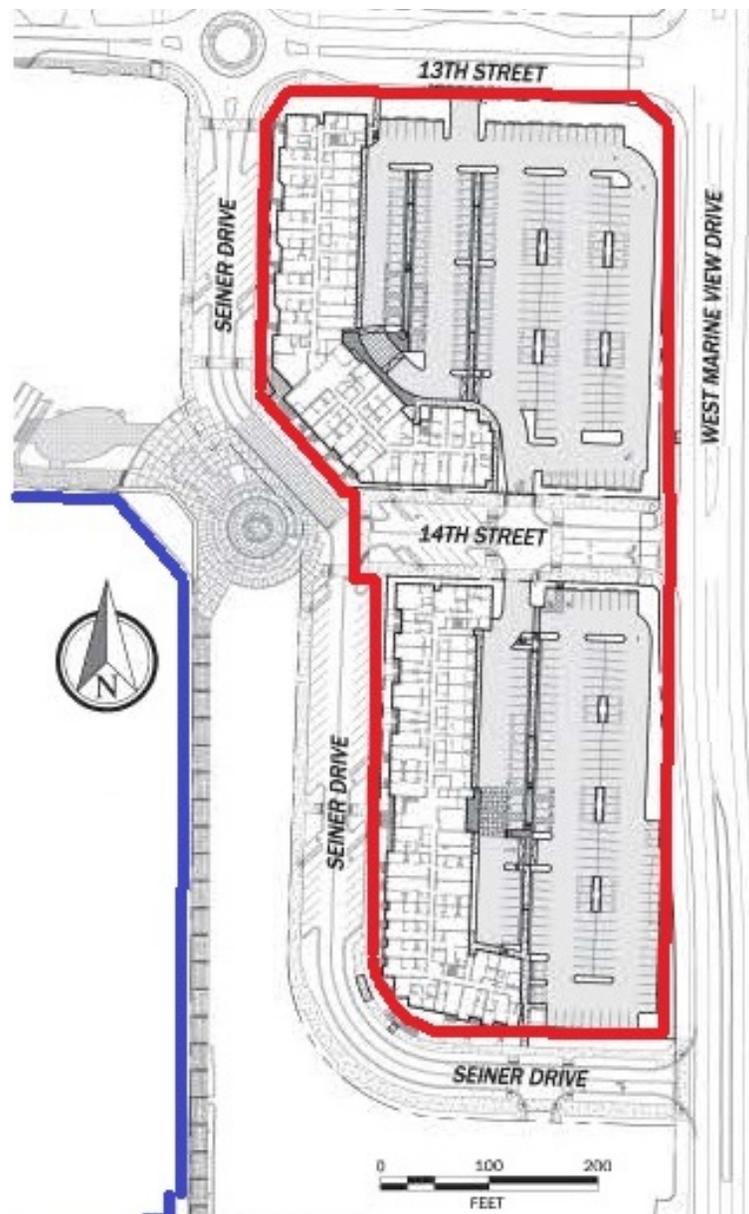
Plan drawing of the Waterfront Place Apartment project site. The apartment complex is outlined in red. The two buildings and parking lots are separated by 14th Street. The parking lots are shown in light gray, with the apartment buildings shown in white, west of the parking lots. The blue lines indicate the Central Marina’s east and north bulkheads (Adapted from page 13 of HUD 2019a).
